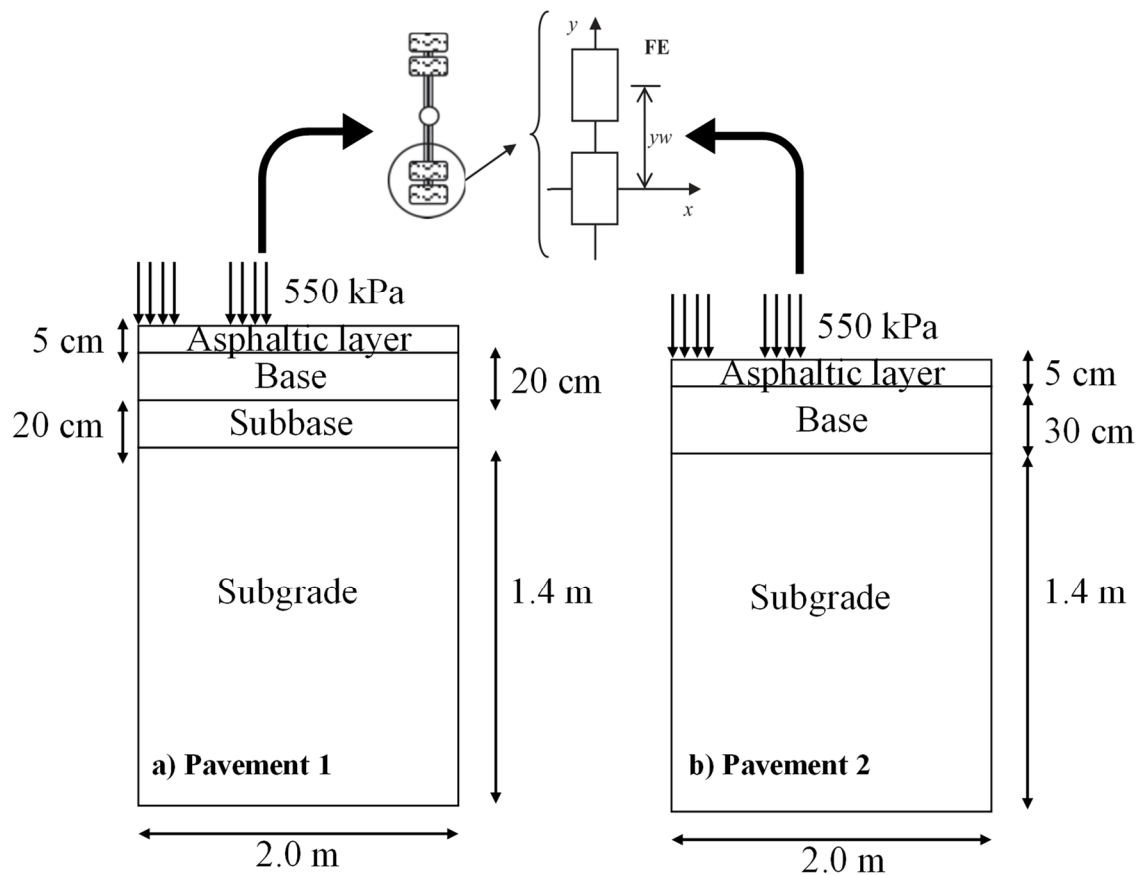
Analyzed pavement structures. a) Pavement 1 and b) Pavement 2
